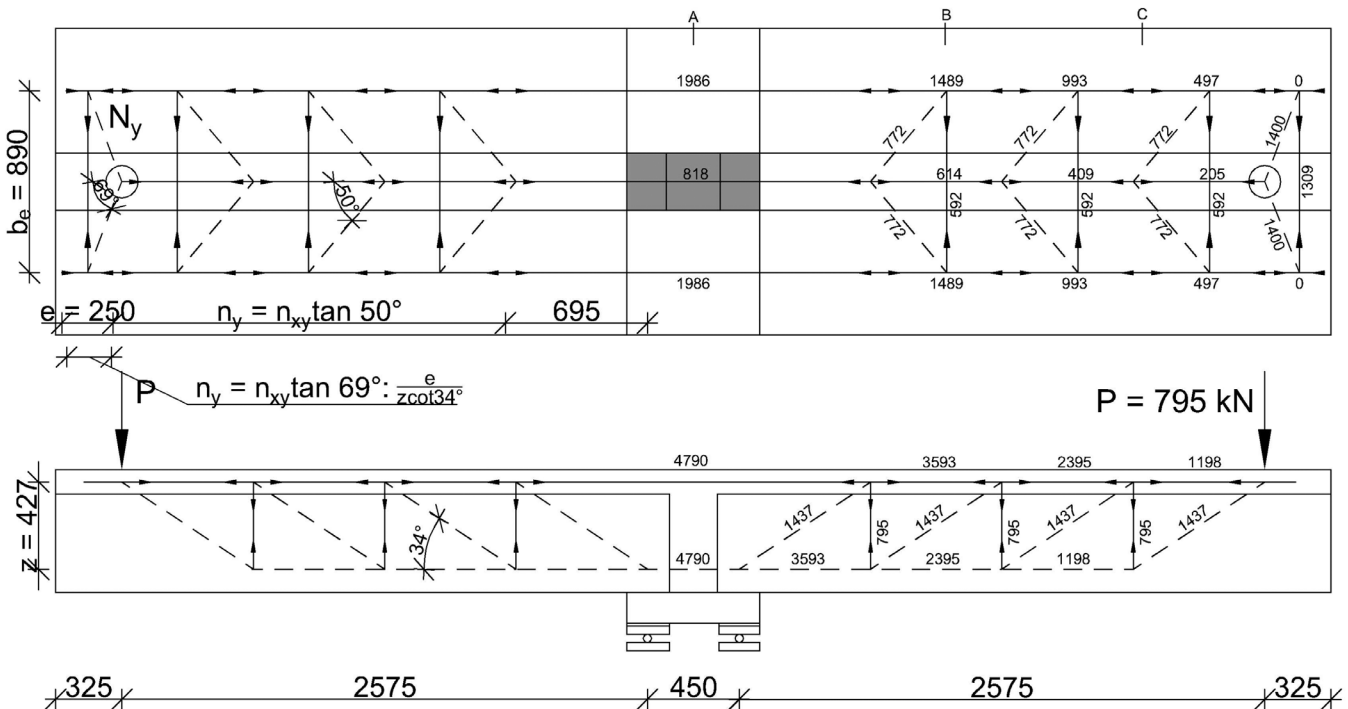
Truss model for test beam 8. Longitudinal flange reinforcement outside the web treated as two units
